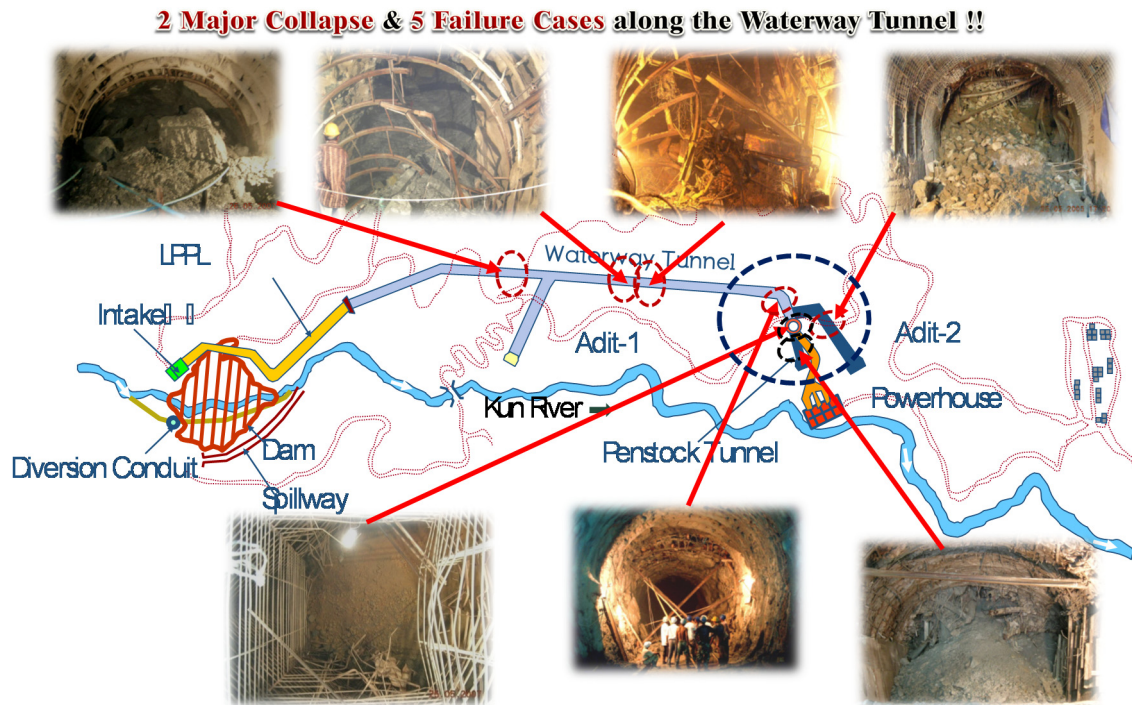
Waterway Tunnel Failure Cases of Kun Project
